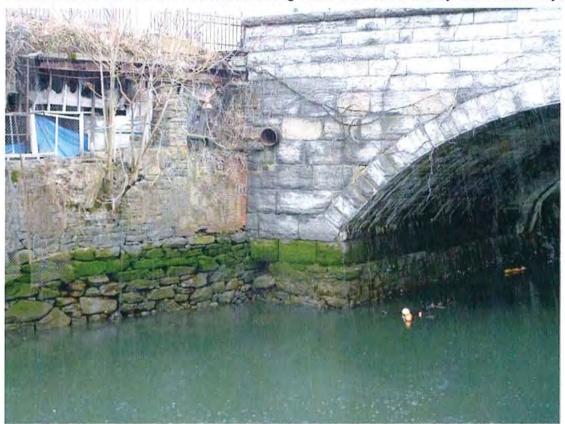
Western bank stone retaining wall located south of the US 1 bridge with building ruin above. View to the northwest.
